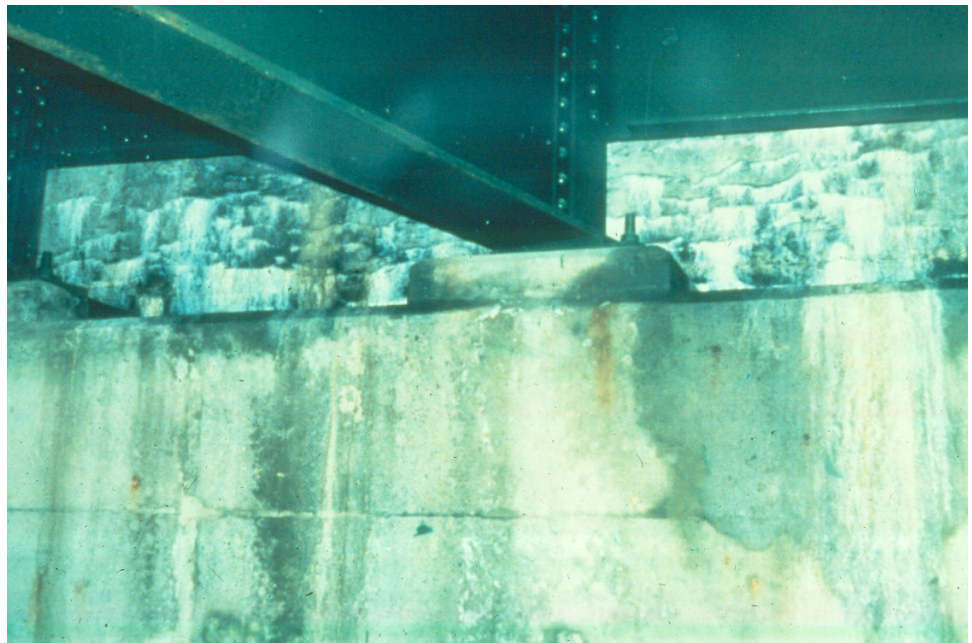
Cracking and Efflorescence in Abutment Backwall
